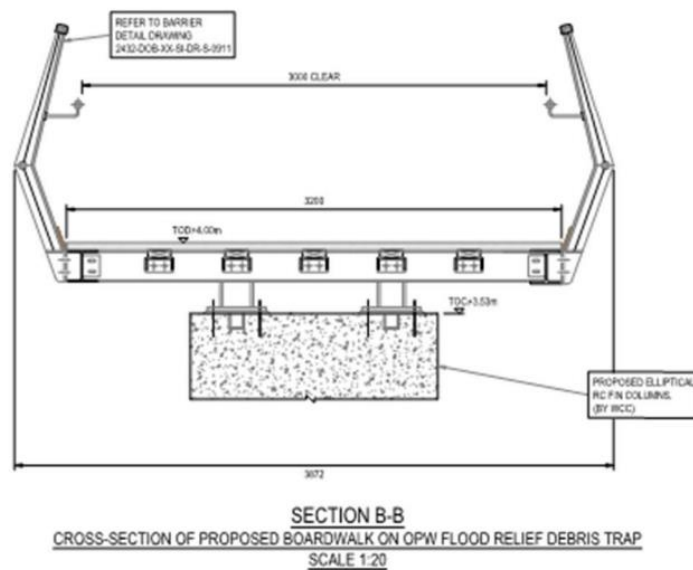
Typical Boardwalk section across WCC Debris Trap Columns
